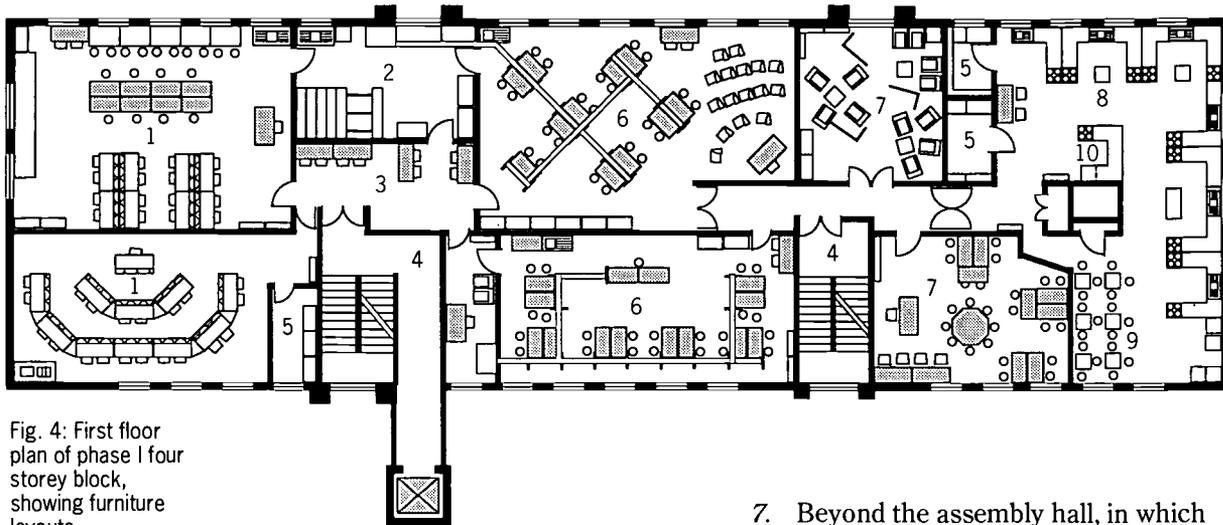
First floor plan of phase I four storey block, showing furniture layouts.
